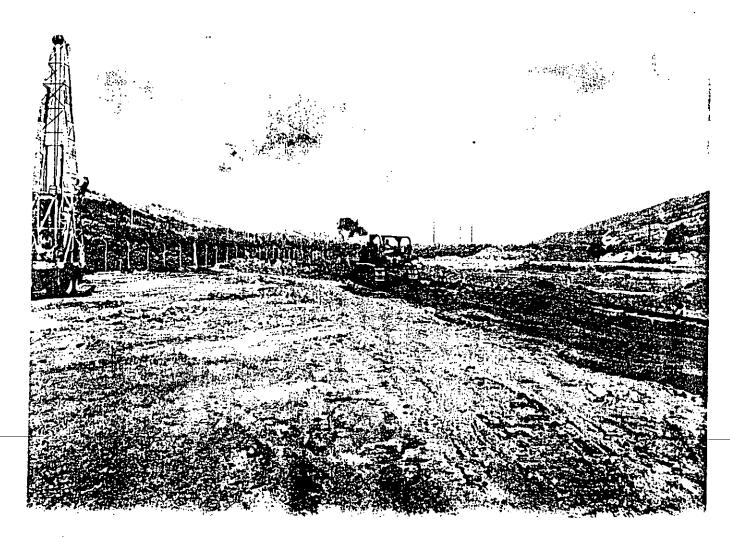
Movement of soil and debris to allow access to the area around the railroad tracks (Fig. 6) at the former ore storage site, Palmerton, Pennsylvania (PP001), looking northeast (August 1988).
